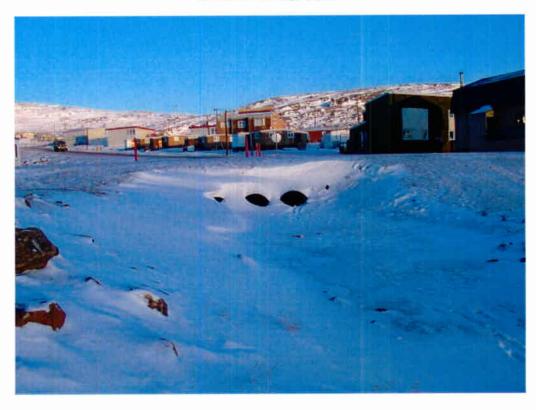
Further downstream, looking north at bridge to Frobisher Inn. This bridge would likely be lost in the event of a dam breach.
